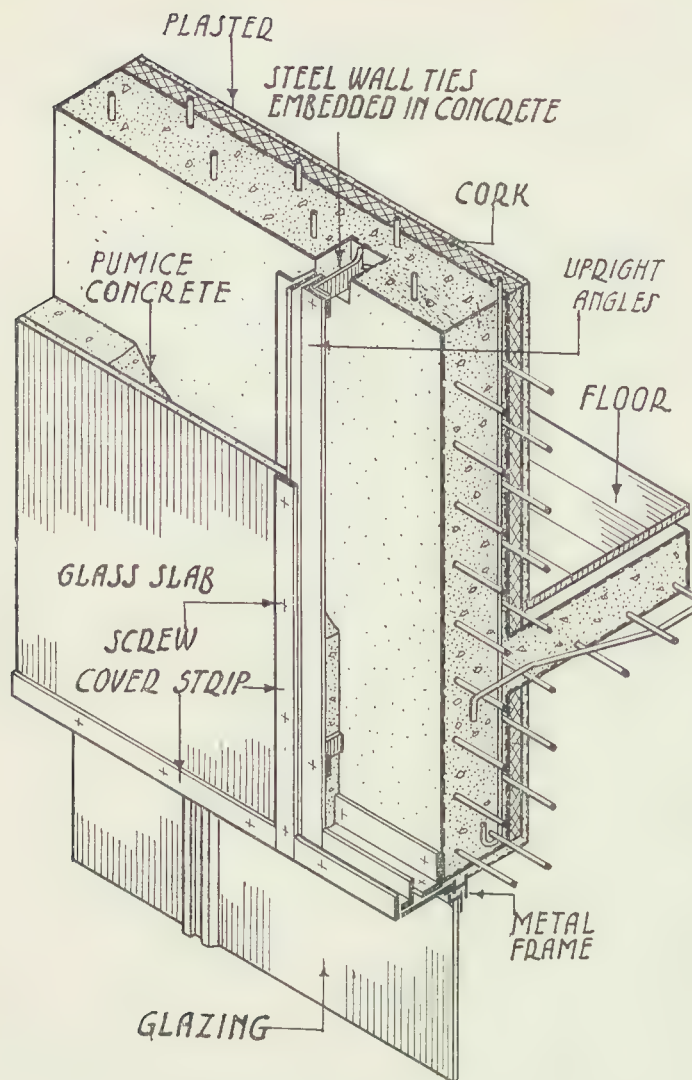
METHOD OF CONNECTING GLASS FACING TO REINFORCED CONCRETE WALL
